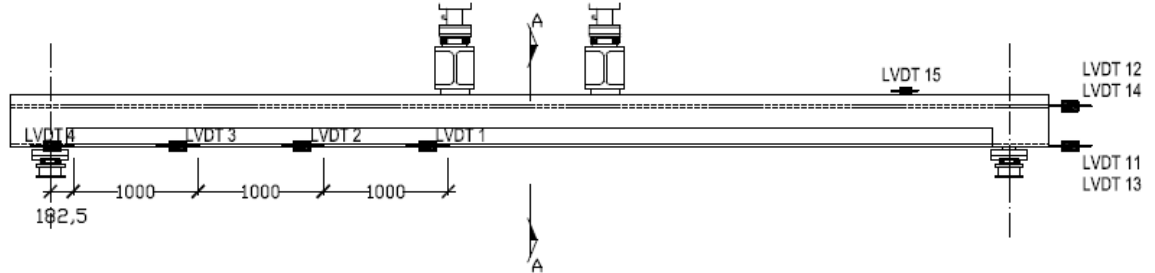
LB3 - North side view. Position of LVDT 1-4 and LVDT 11-15.
